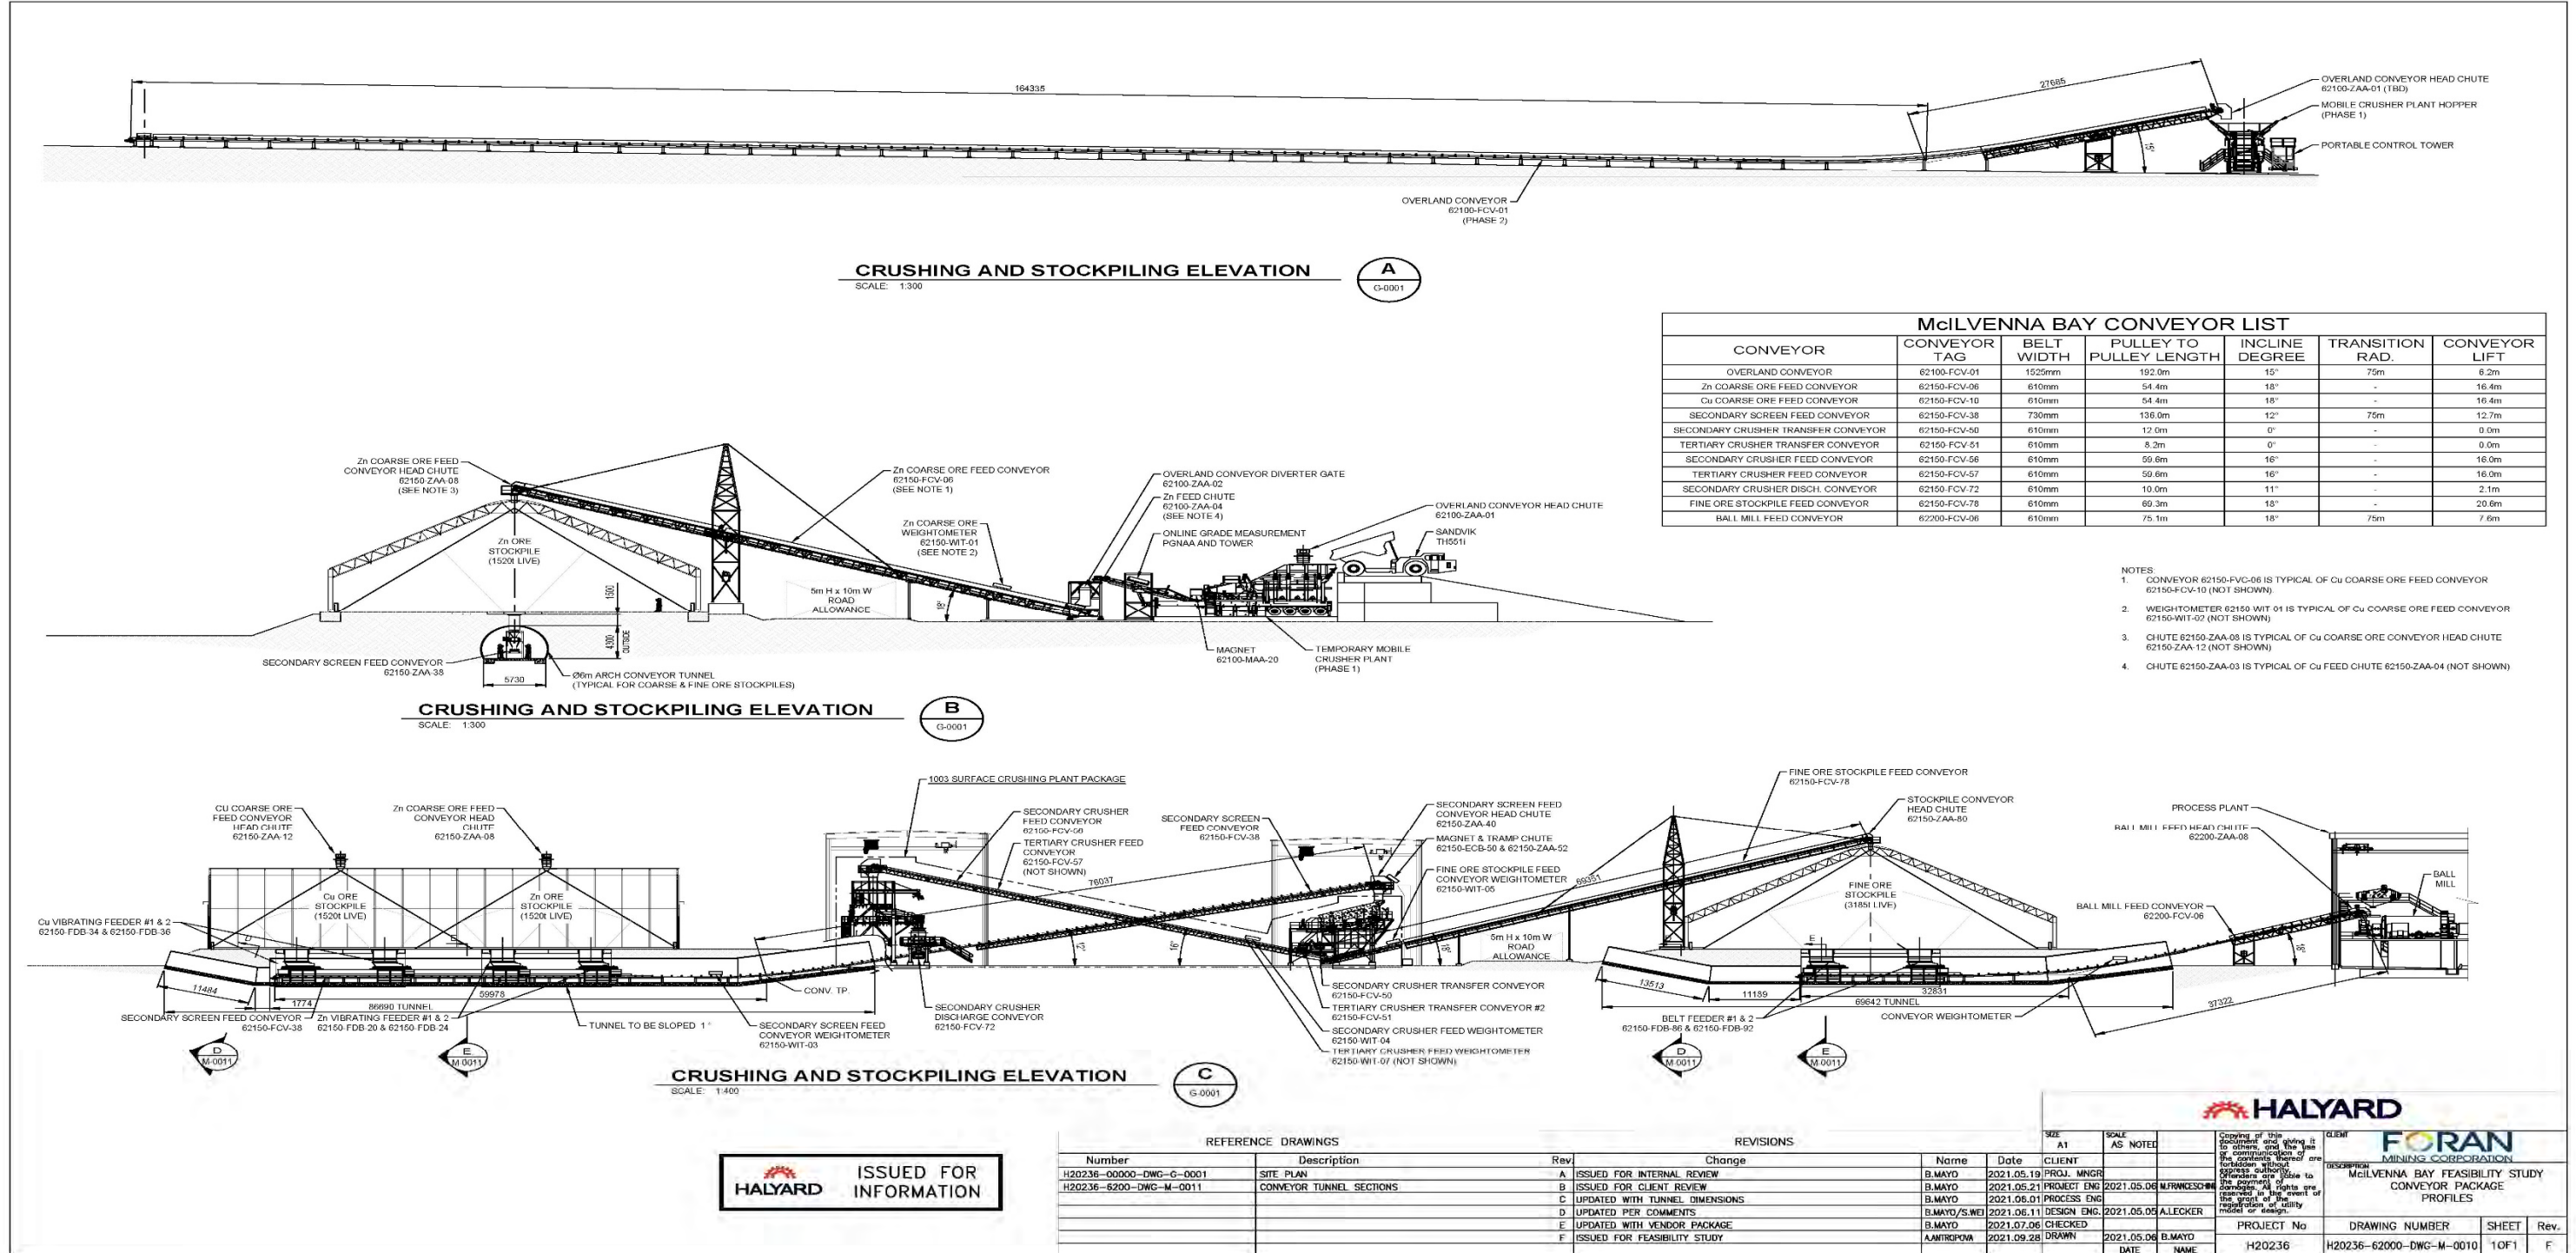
Schematic of Sorting, Crushing and Screening. Ore Stockpiles would be under Covered Buildings.
